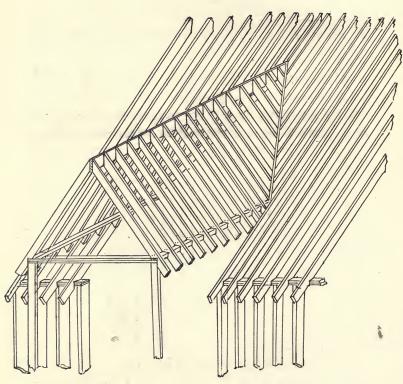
ROOF TIMBERS WHEN RAISED.
